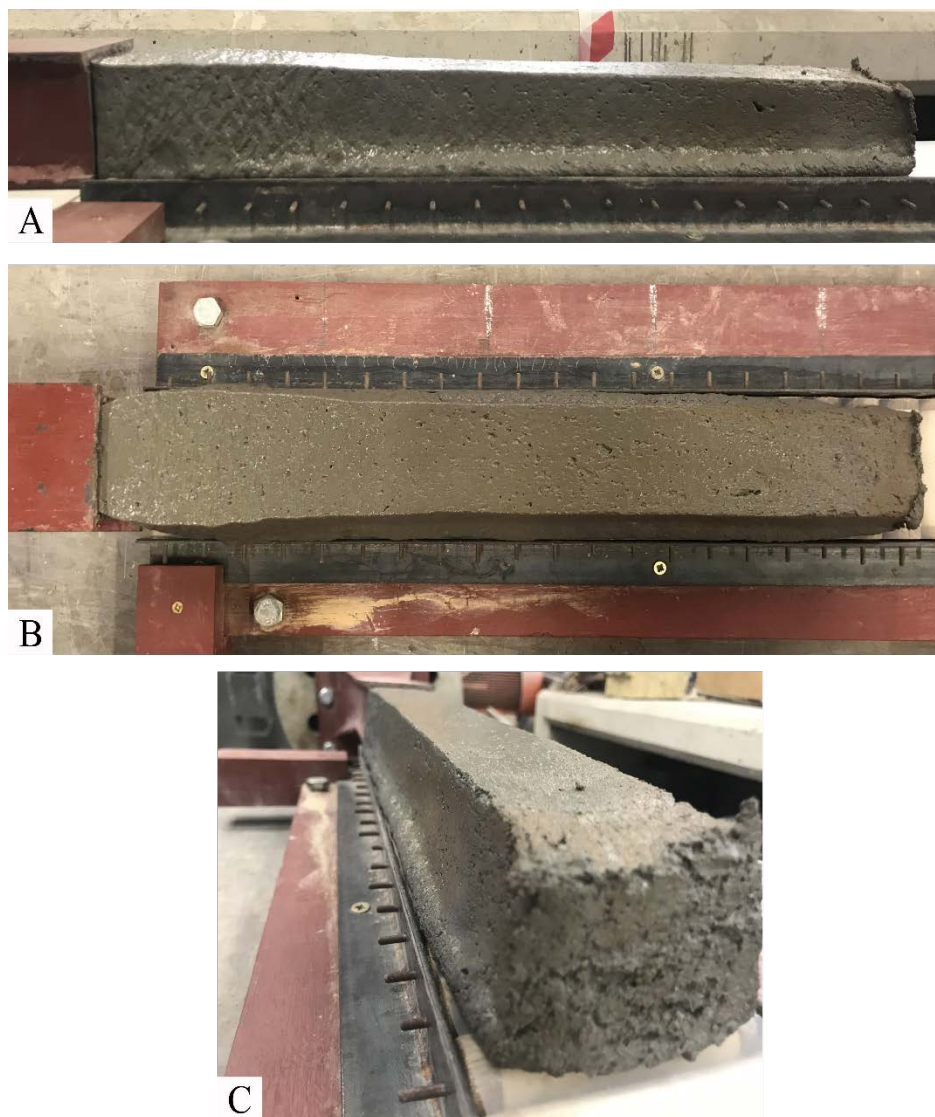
Extruded filament layer with dimensions 40x40 mm illustrated by a) side view, b) top view and c) perspective view.
